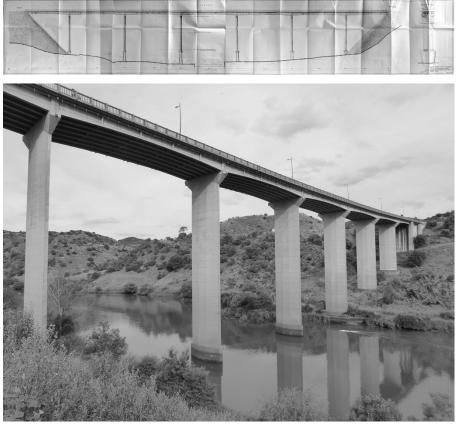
December 1957 Quiamafulo project for pre-stressed concrete variant (above) to set on existing piers, Credit Portugal, Arquivo Histórico Ultramarino – PT/IPAD/MU/DGOPC/DSPE/1773/17464, and Mértola Bridge. Notice slender mass concrete pillars (Photograph: J. Saldanha, Apr. 2021).
